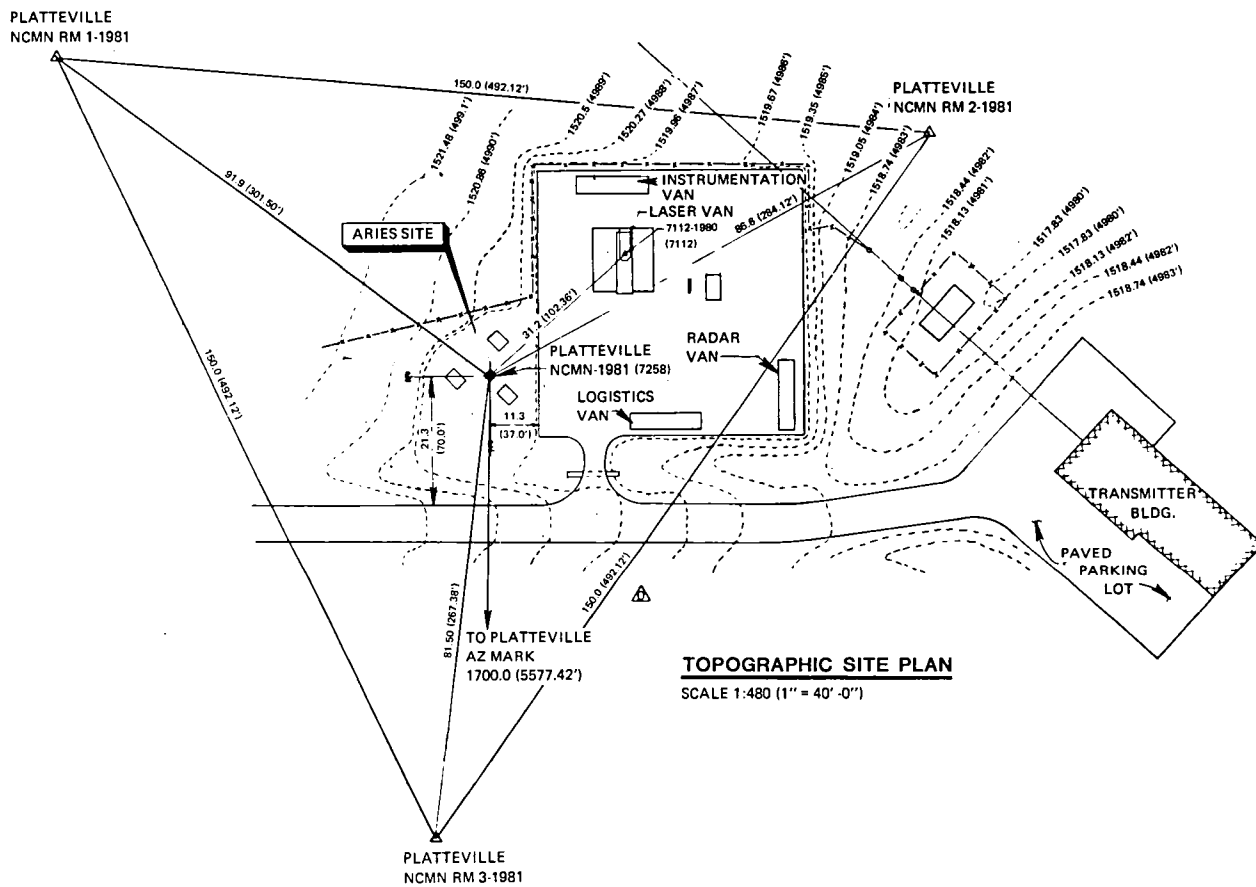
PLATVL. PLATTEVILLE Site Sketch
